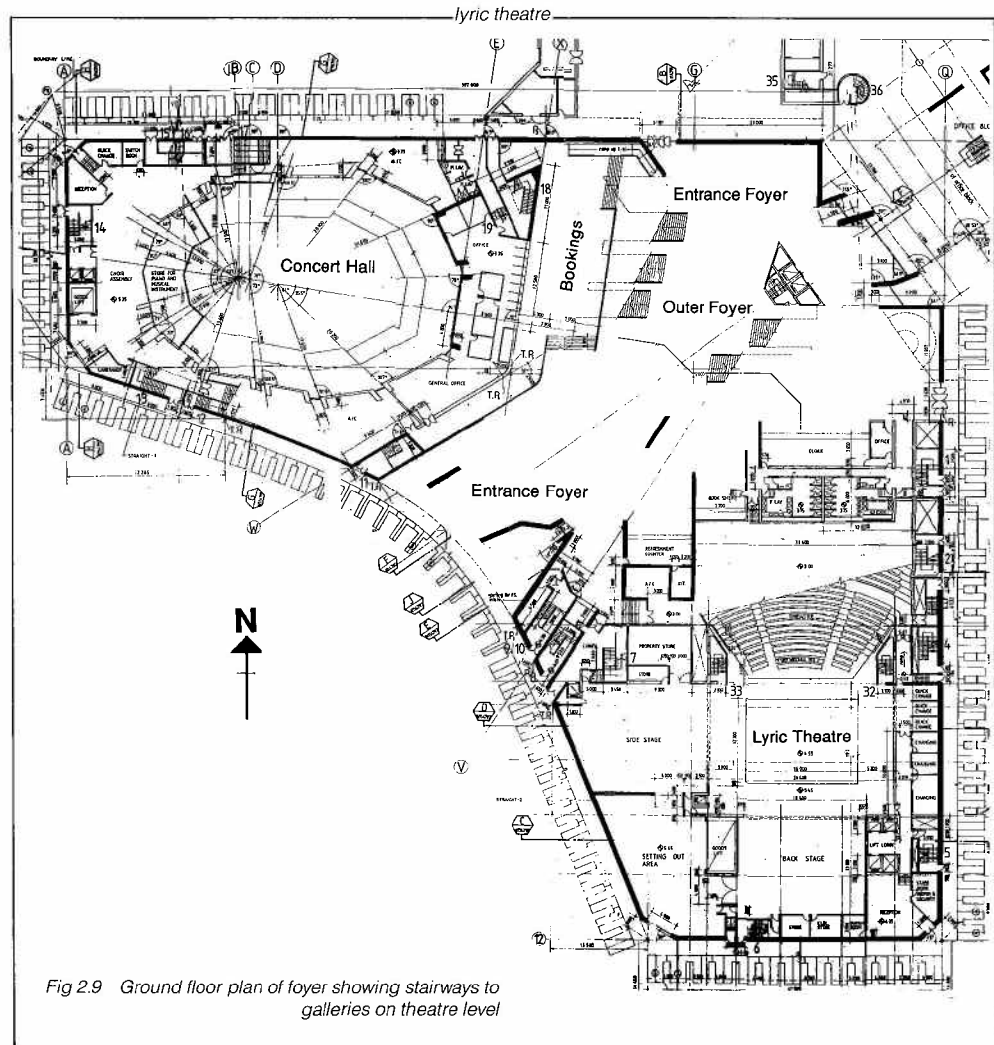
Ground floor plan of foyer showing stairways to galleries on theatre level
